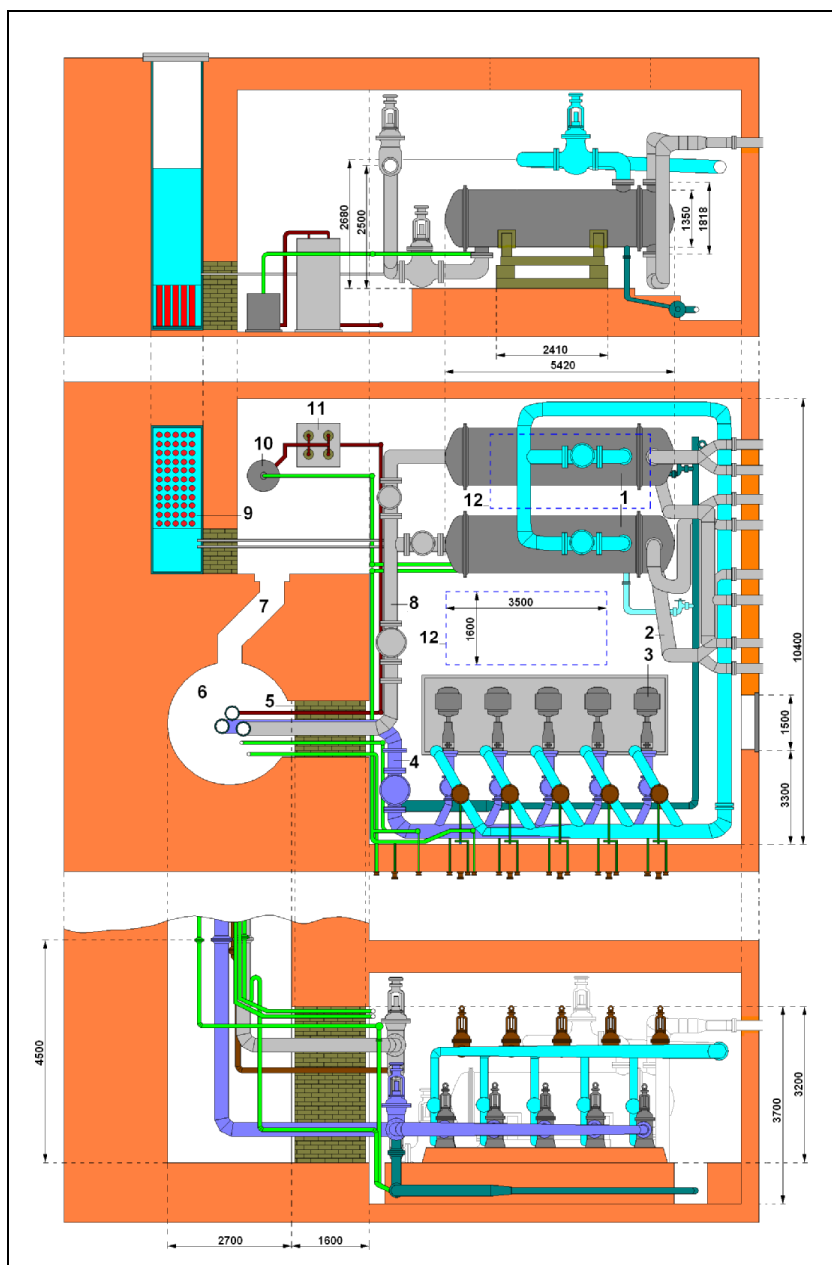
Layout of equipment in the PCC pump-premise: 1- HE; 2 - SCC pipe-lines; 3 - pumps; 4 – PCC inlet pipe-line; 5 – brick wall; 6 – under reactor space (niche); 7 – labyrinth; 8 – PCC outlet pipe-line; 9 – at-reactor cooling pond (SF storage); 10 – thermal-oxidative filter; 11 – ion-exchange filter; 12 - projection of technological hatches
